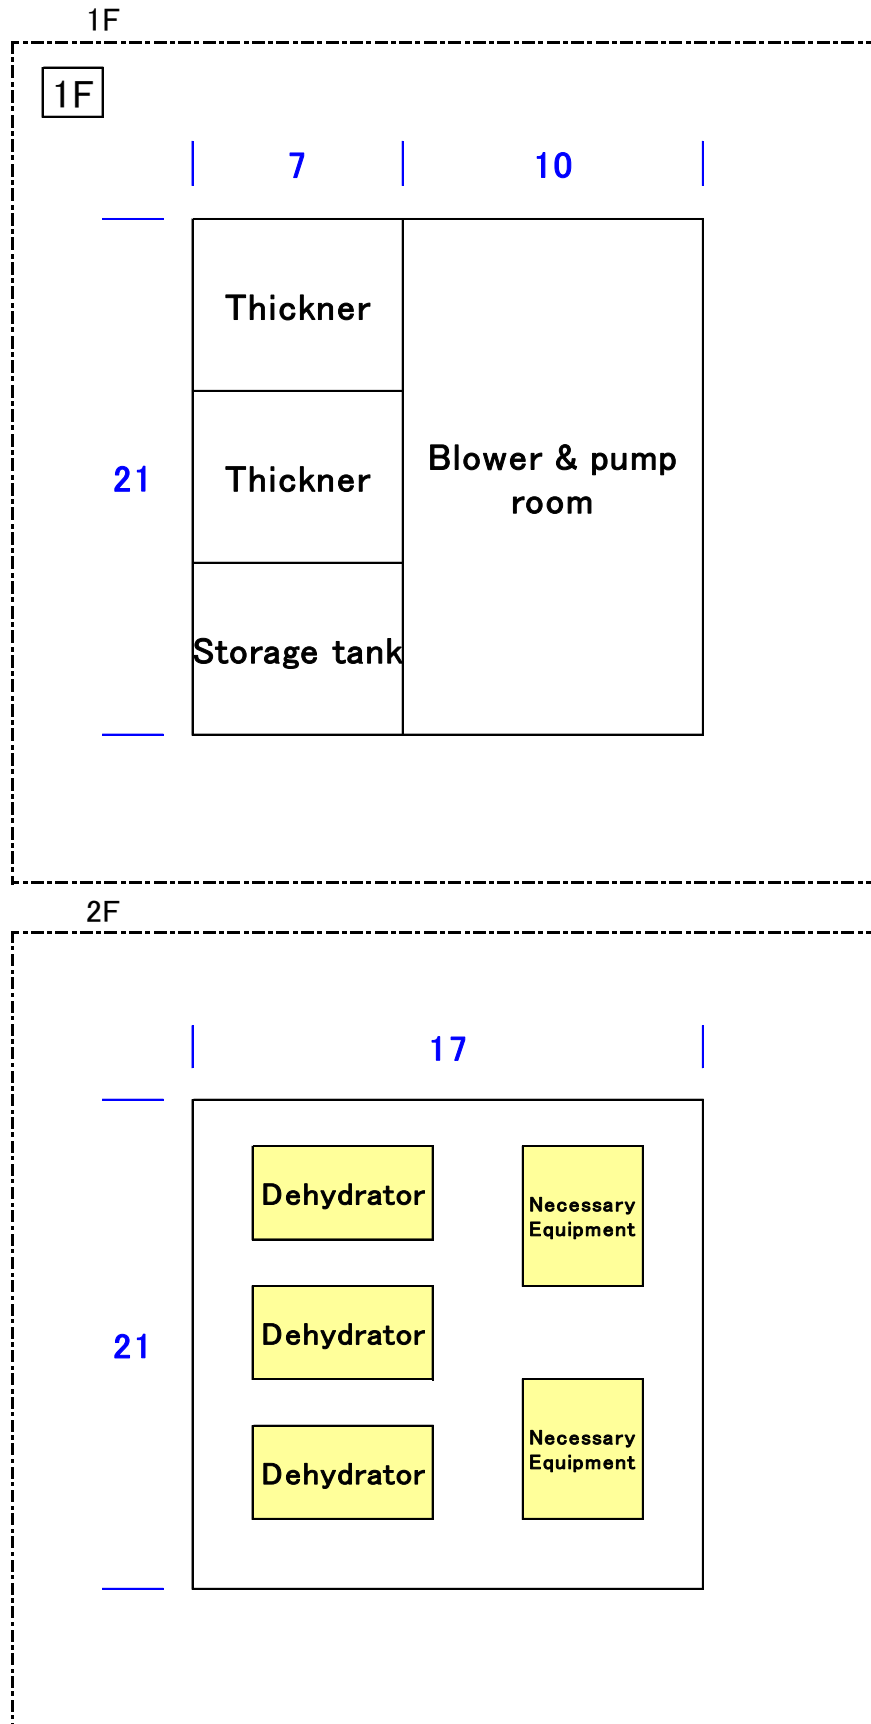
Layout Plan (Rehabilitation of Existing Sludge Treatment Plant)
